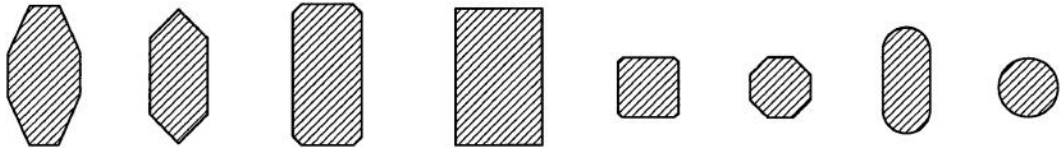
Typical cross-section shapes of piers for overcrossings or viaducts on land.
